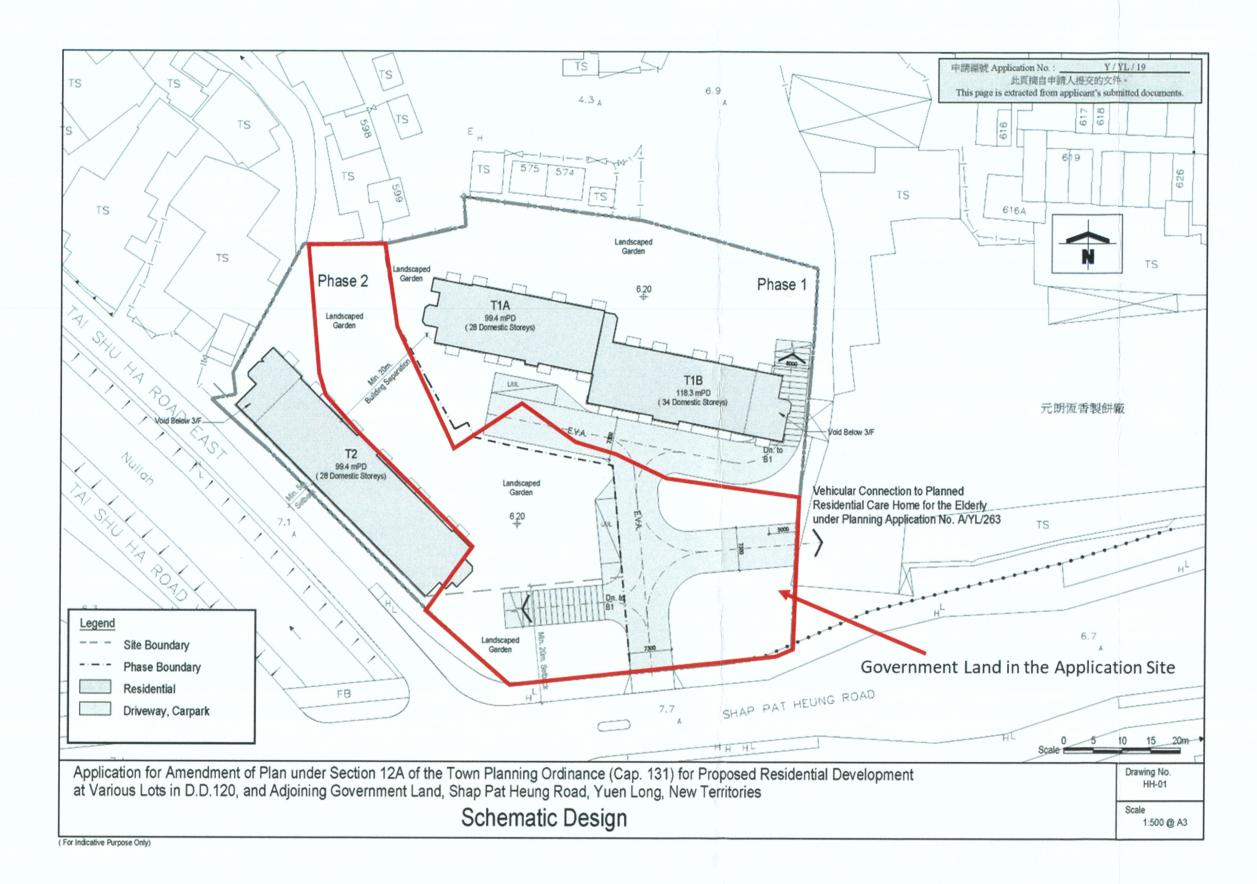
Location of Private Open Space and the government land in the application site (source: the application (no. Y/YL/19))
